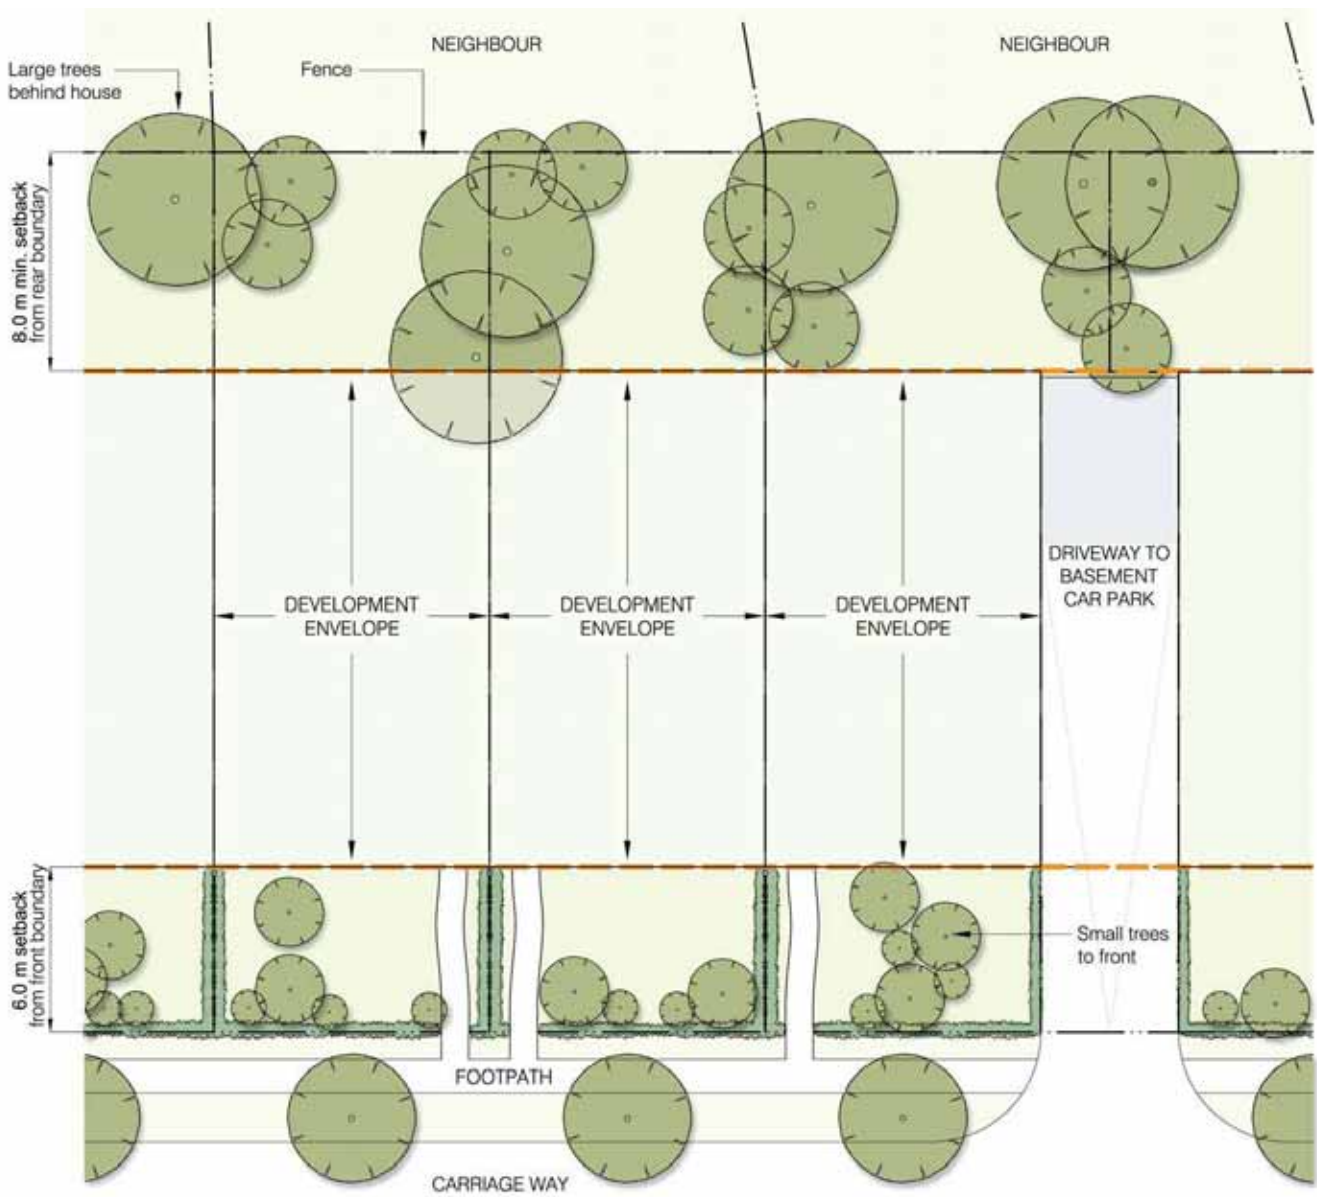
Development Envelope and Landscape (Townhouses Type A)
